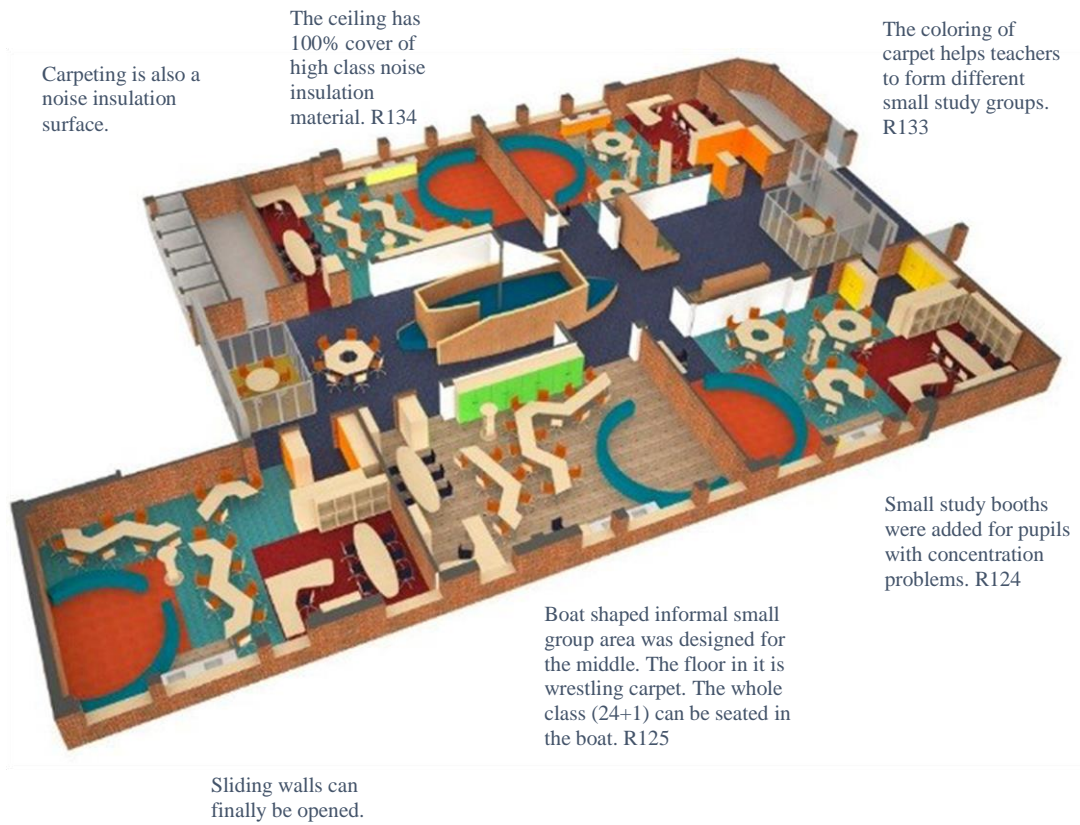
New learning space plan (architect 3D plan). The doors and sliding walls are not drawn
